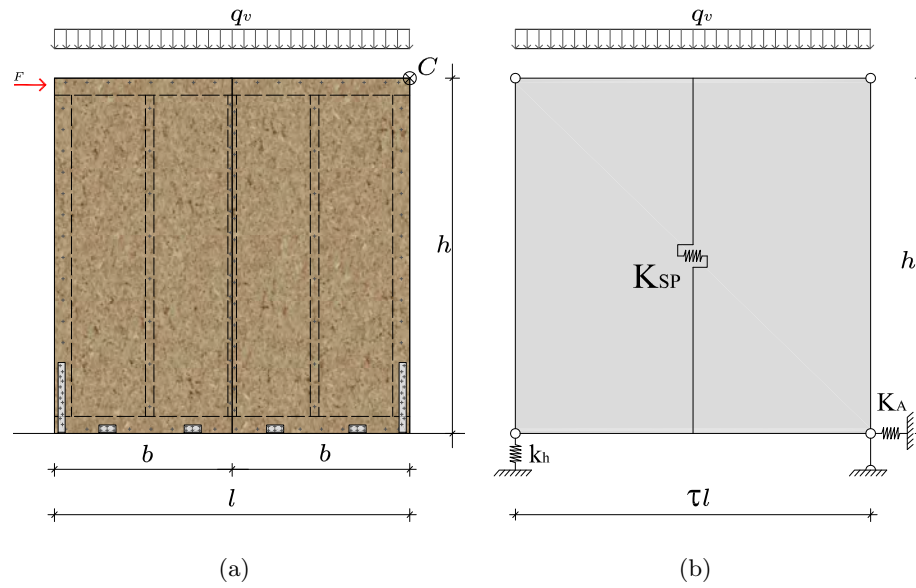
Light timber-frame wall: (a) configuration and loads, (b) simplified numerical model.
